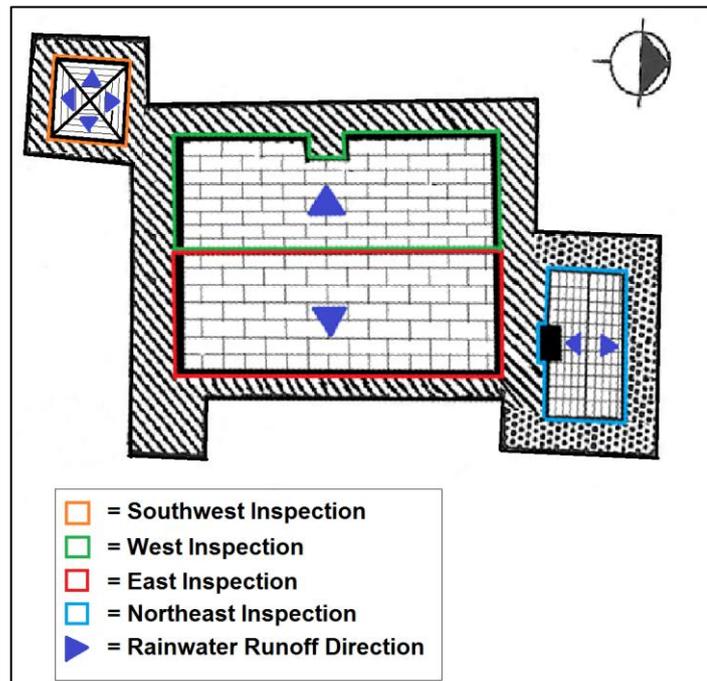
Plan of Barryscourt: Inspection sections – Adjusted sketch from (Monk & Tobin, 1991)
